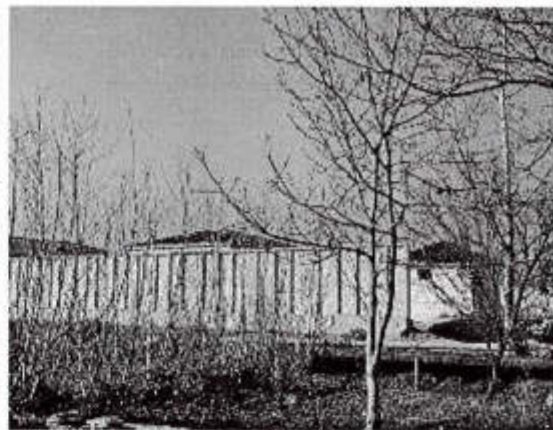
Existing facilities on Kokand TSS and non completed fence of Kokand TSS
